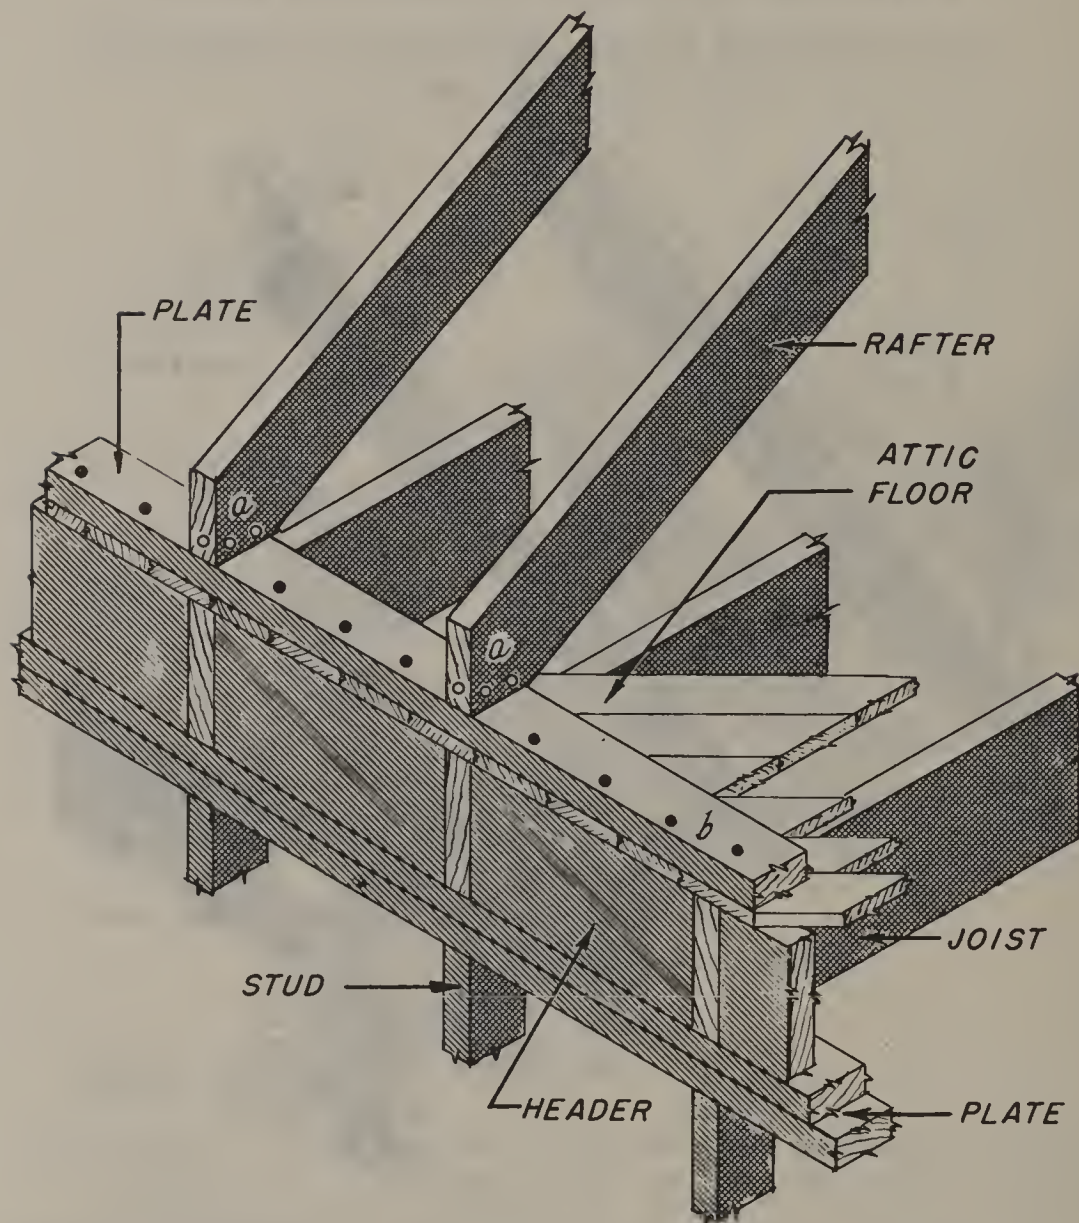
Beveled rafters resting on plate. *a*, Rafter toenailed to plate with five tenpenny nails, two on each side and one through vertical cut of rafter. *b*, Plate nailed through attic floor to each joist with one sixteenpenny nail and to headers or header joist with sixteenpenny nails spaced 4 inches on centers. Note: Additional security against uplift, if needed, may be attained by the use of straps as shown in figure 50.
